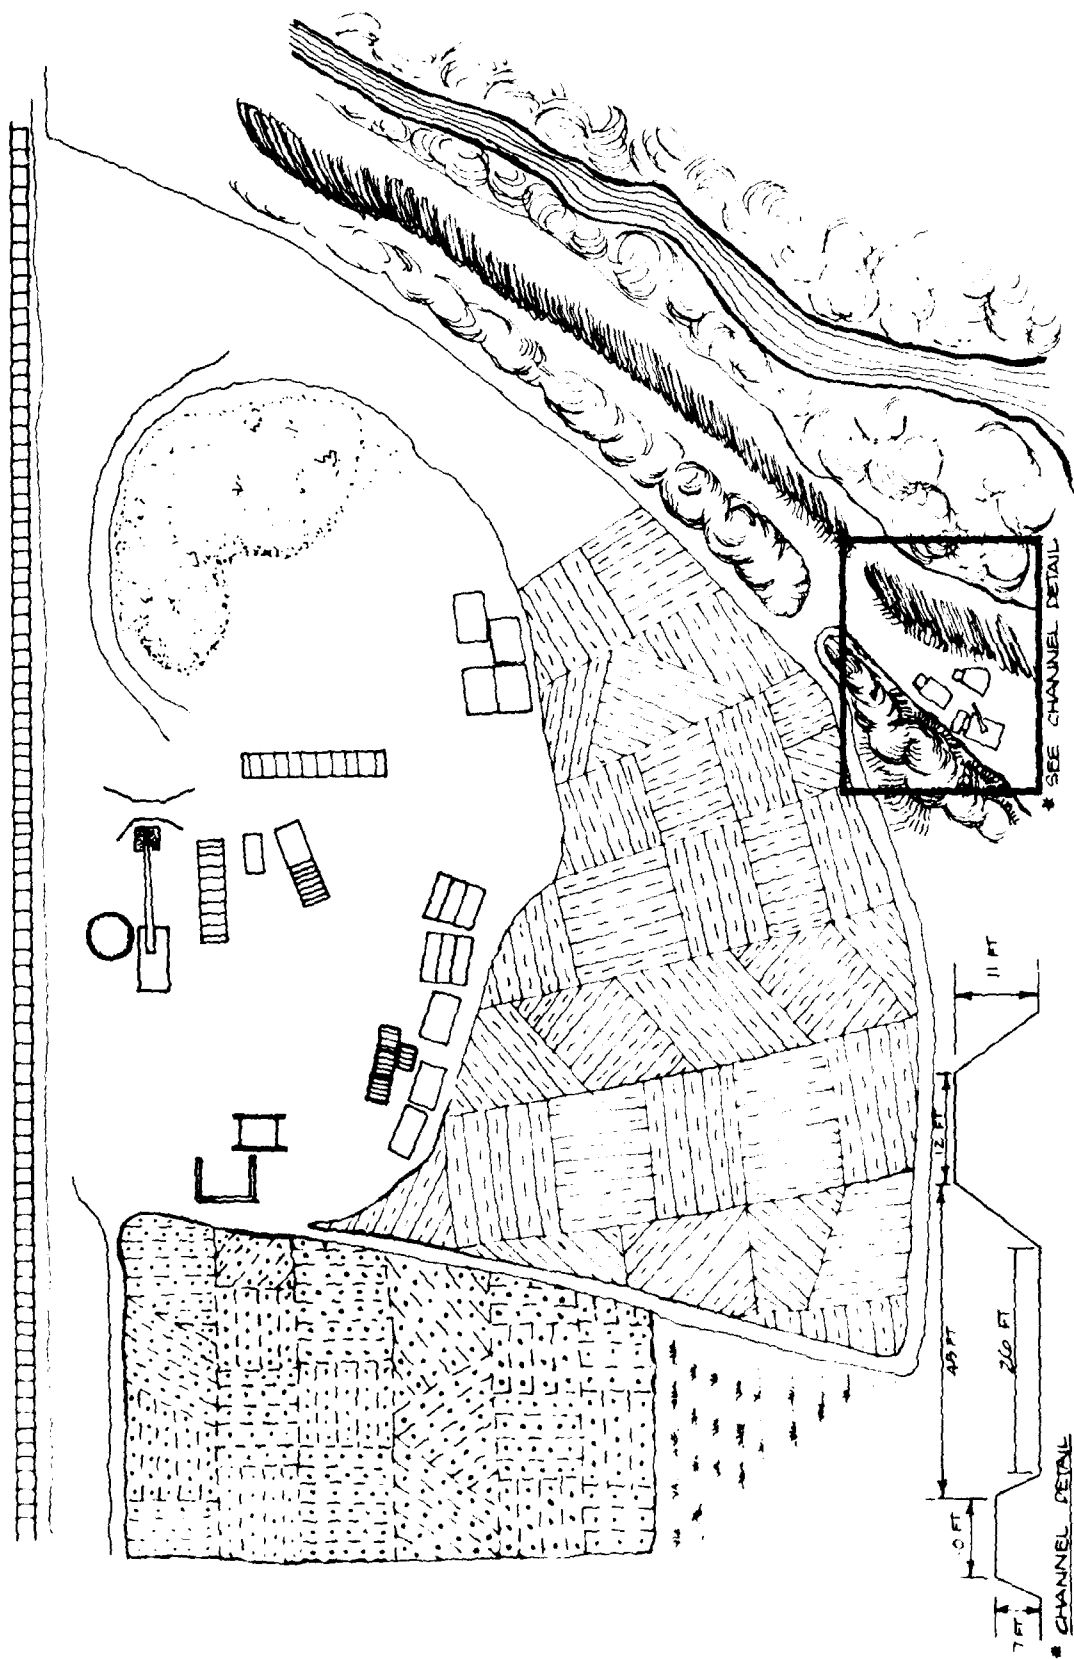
A Composite View of Plant and Nearby Hardening Site.
